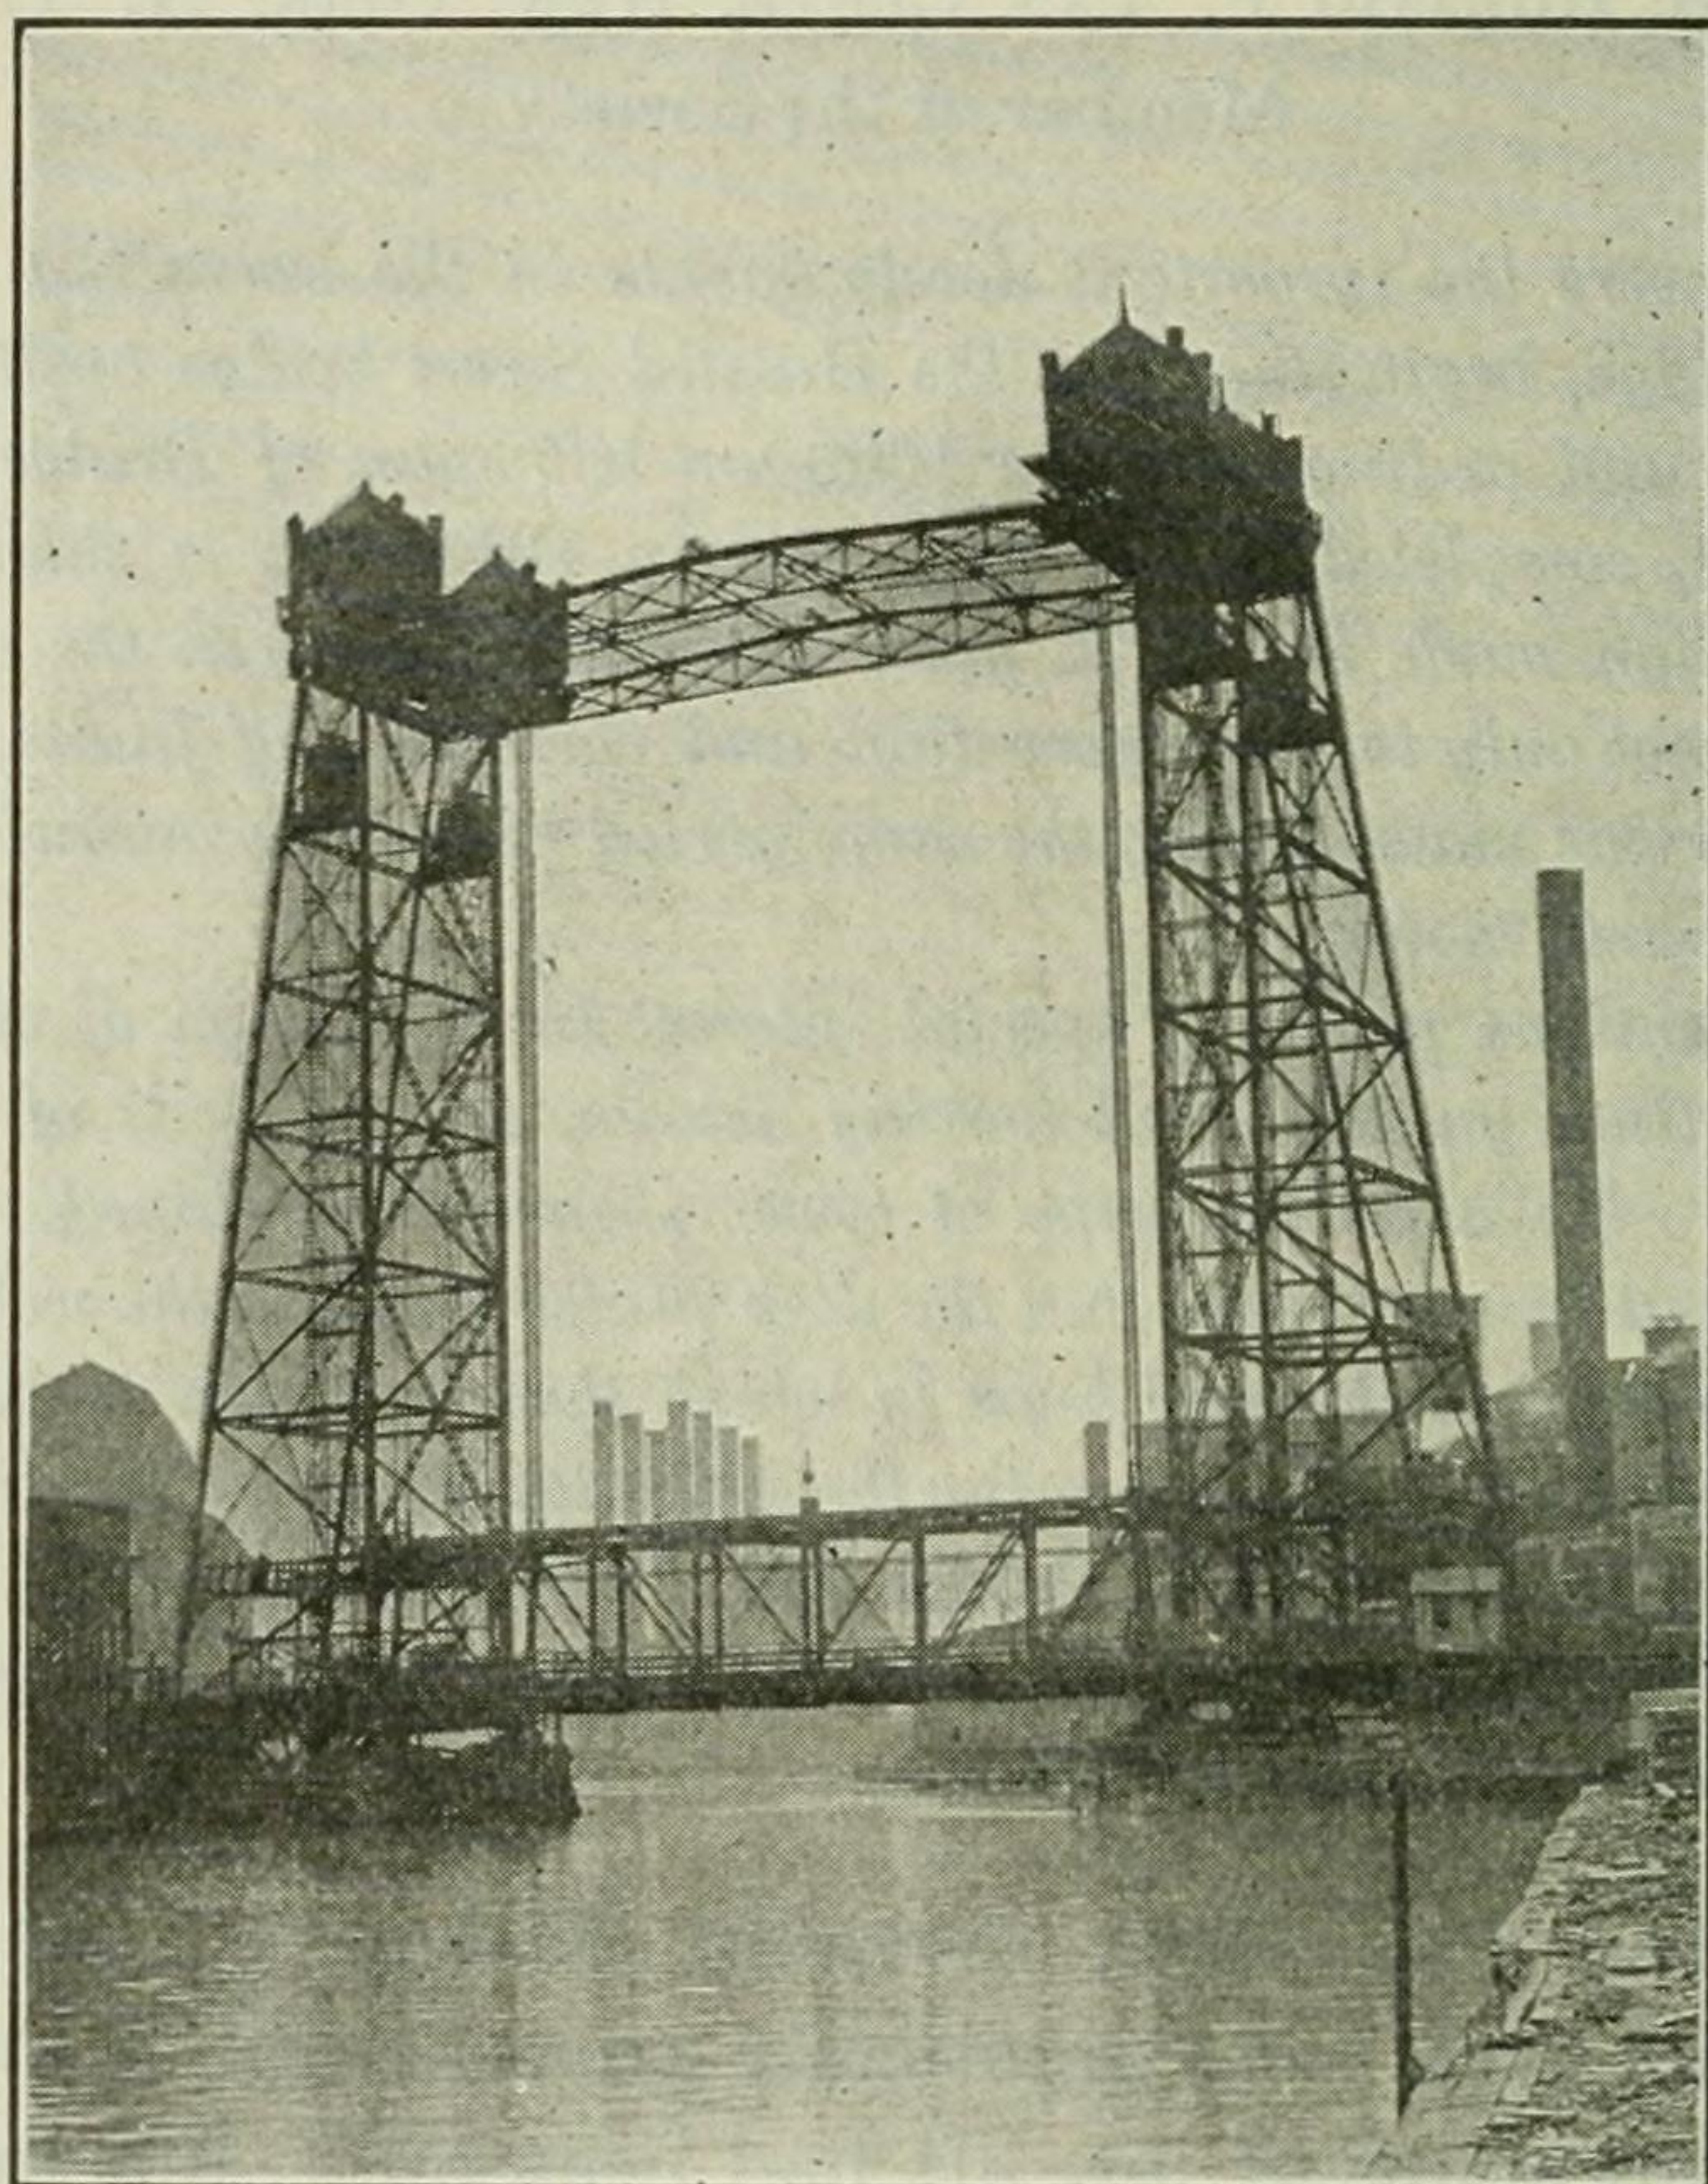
HALSTED STREET BRIDGE OVER SOUTH BRANCH OF CHICAGO RIVER, CHICAGO, ILL.
